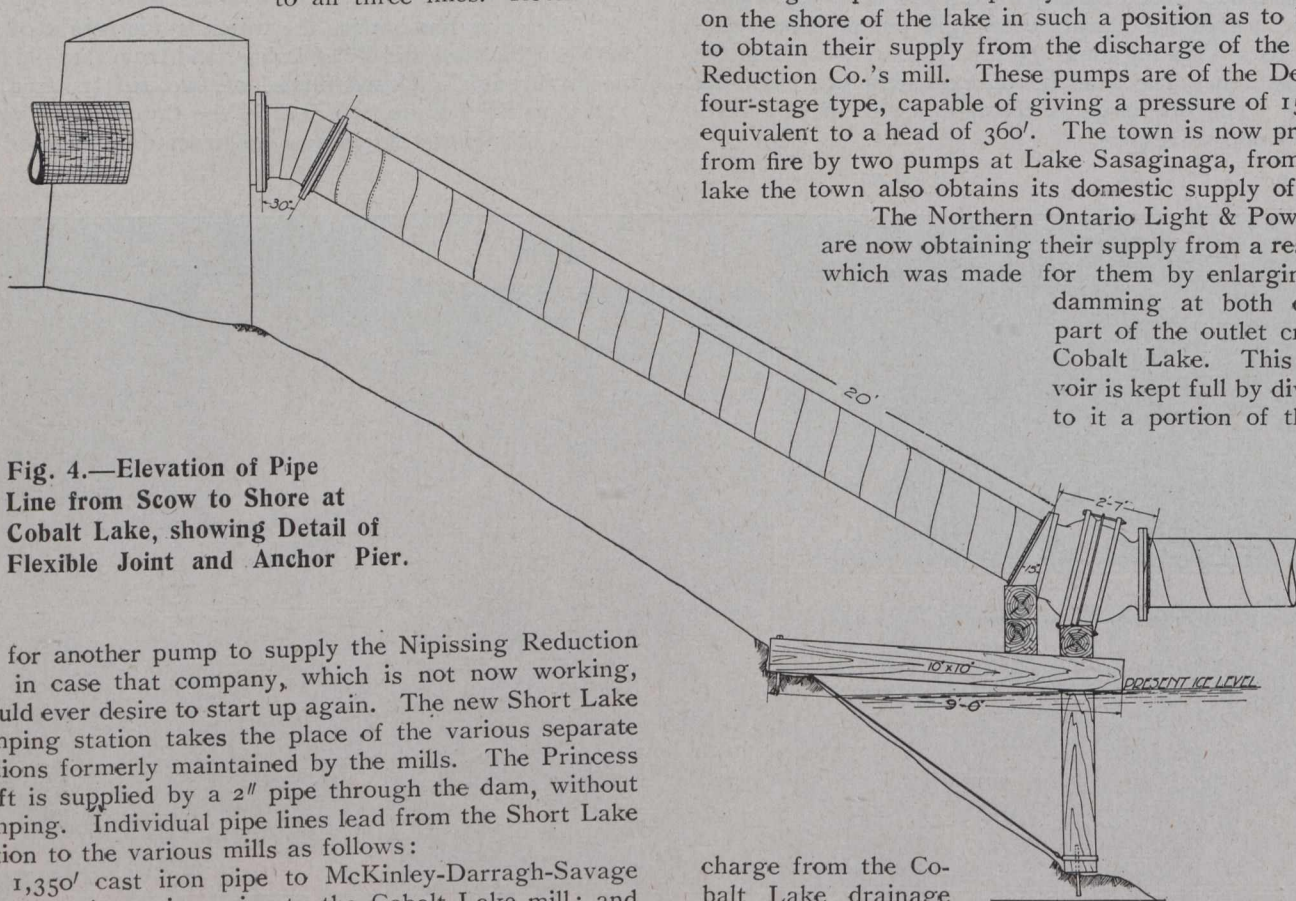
Elevation of Pipe Line from Scow to Shore at Cobalt Lake, showing Detail of Flexible Joint and Anchor Pier.
